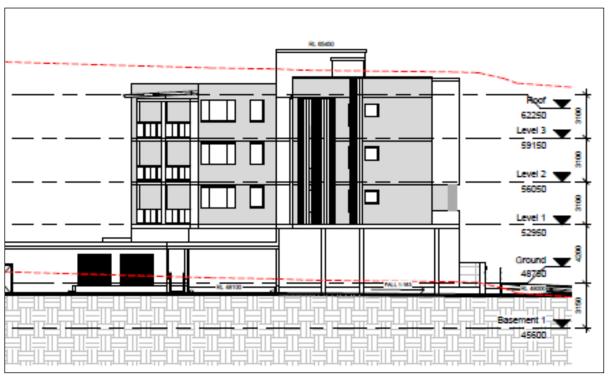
Section plan showing building elements which exceed the 15m height control limit.
